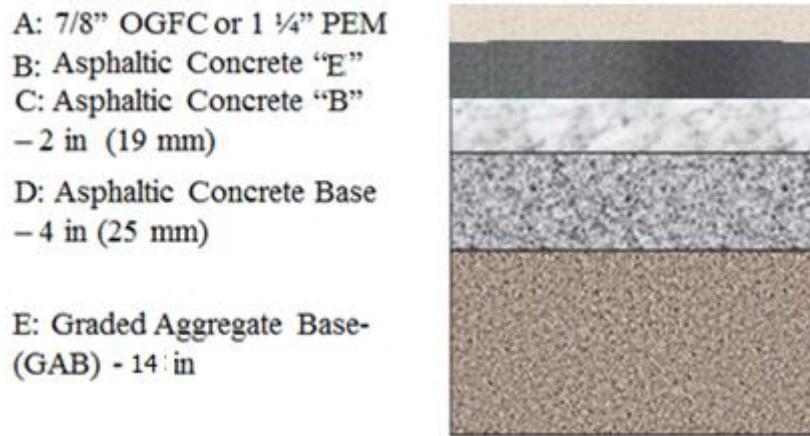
Pavement Structure on I-95 Site in Chatham County
